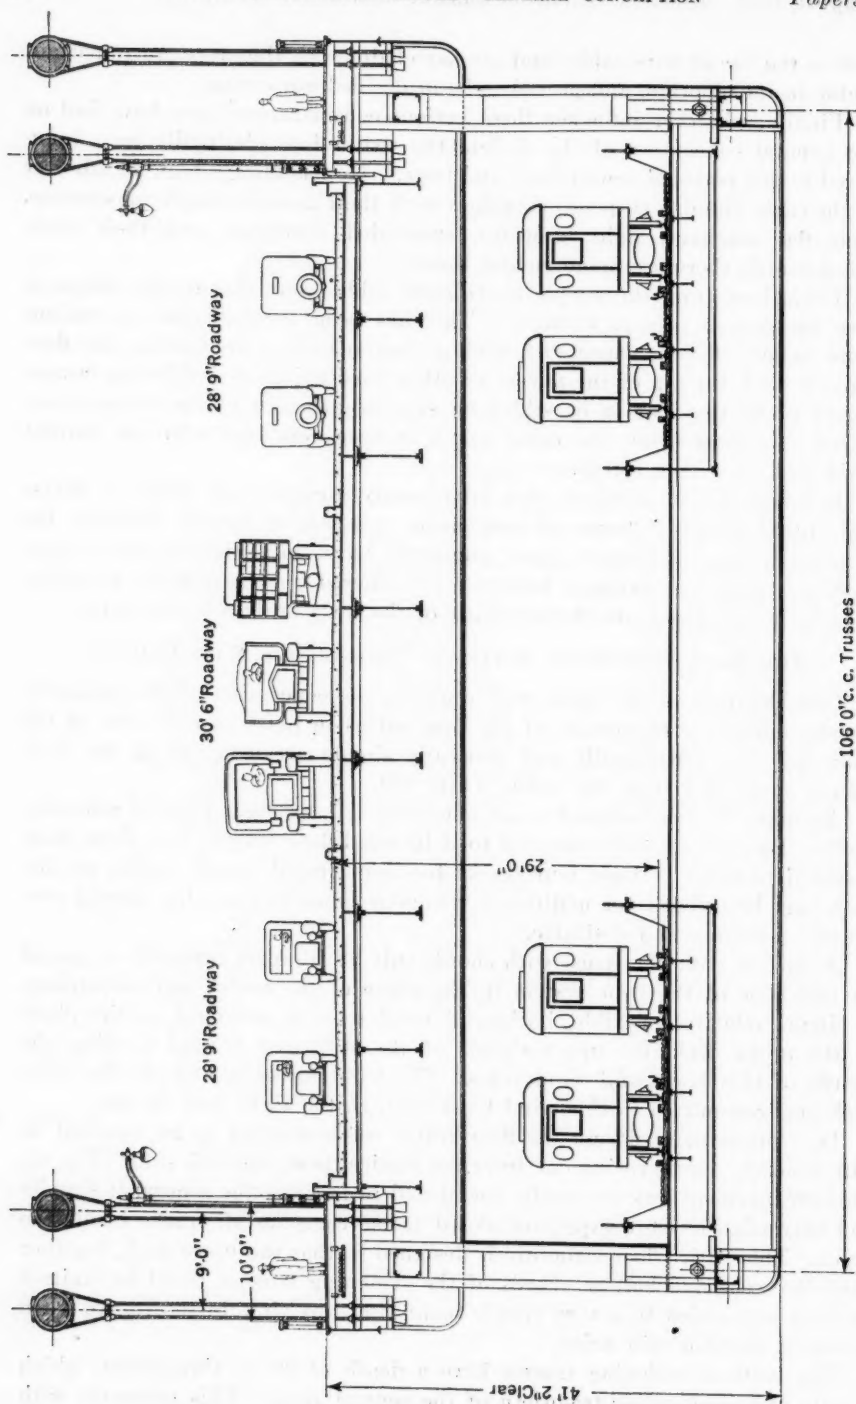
TYPICAL CROSS-SECTION OF DOUBLE-DECK FLOOR, GEORGE WASHINGTON BRIDGE.
